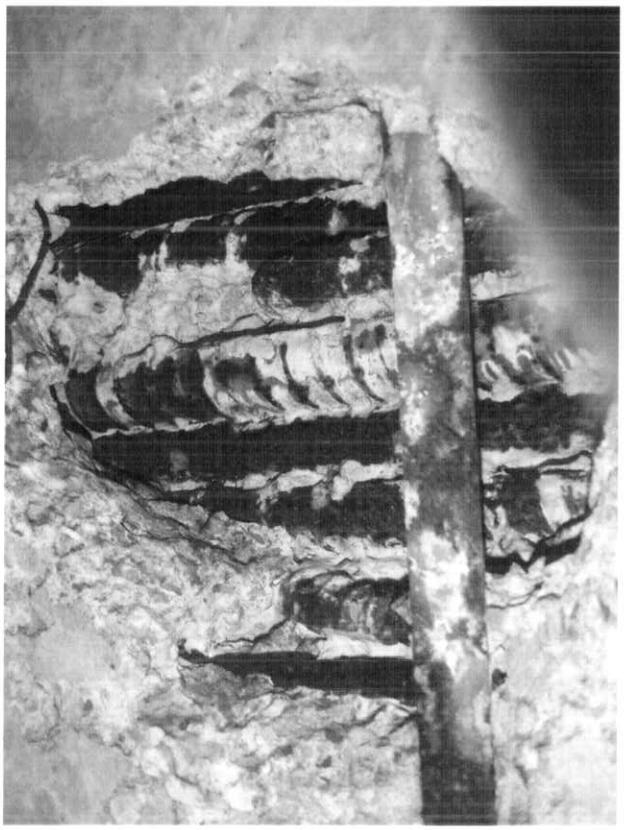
HOLE IN BOTTOM OF GIRDER # 5 IN SPAN # 2 NEXT TO PIER.
